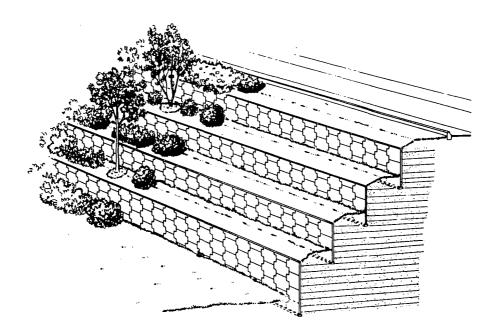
Tiered, Reinforced Earth wall design with landscaped benches. Lateral earth support is provided mainly by metallic strips which extend back into the slope and which are connected to thin facing elements at the front of the wall. Roots of vegetation growing on the benches provide secondary reinforcement.
